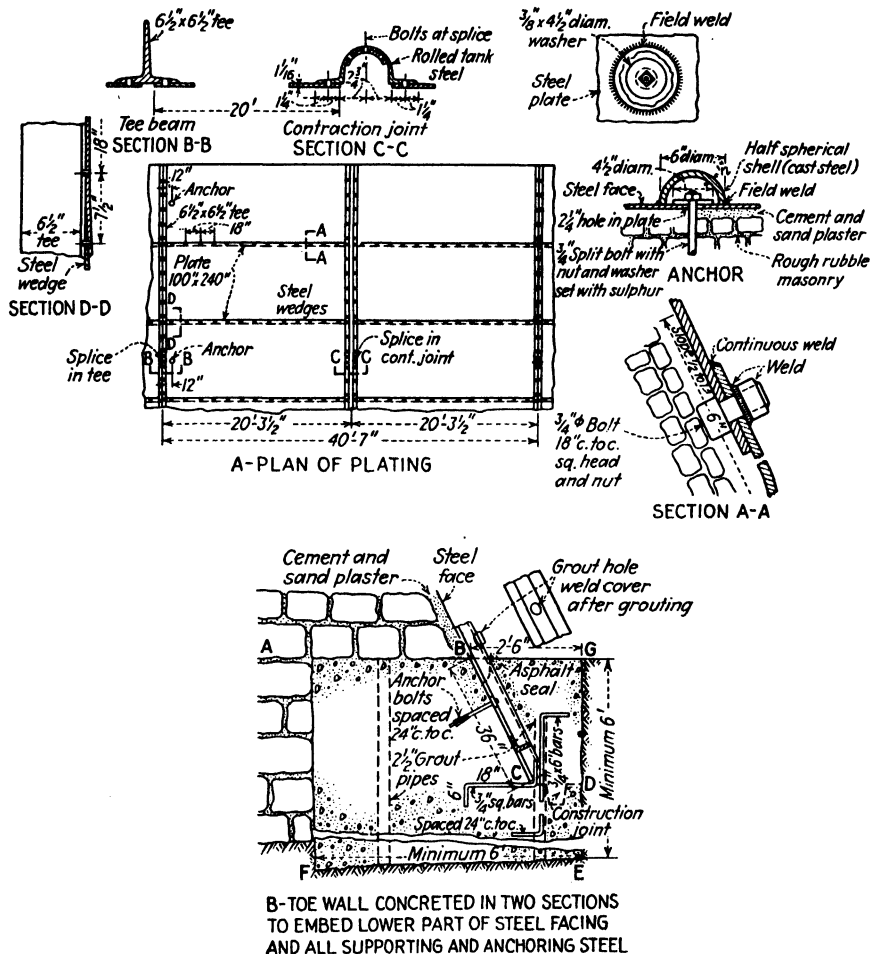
Steel-face details, Penrose-Rosemont Dam, Broadmoor Hotel, Colorado.
